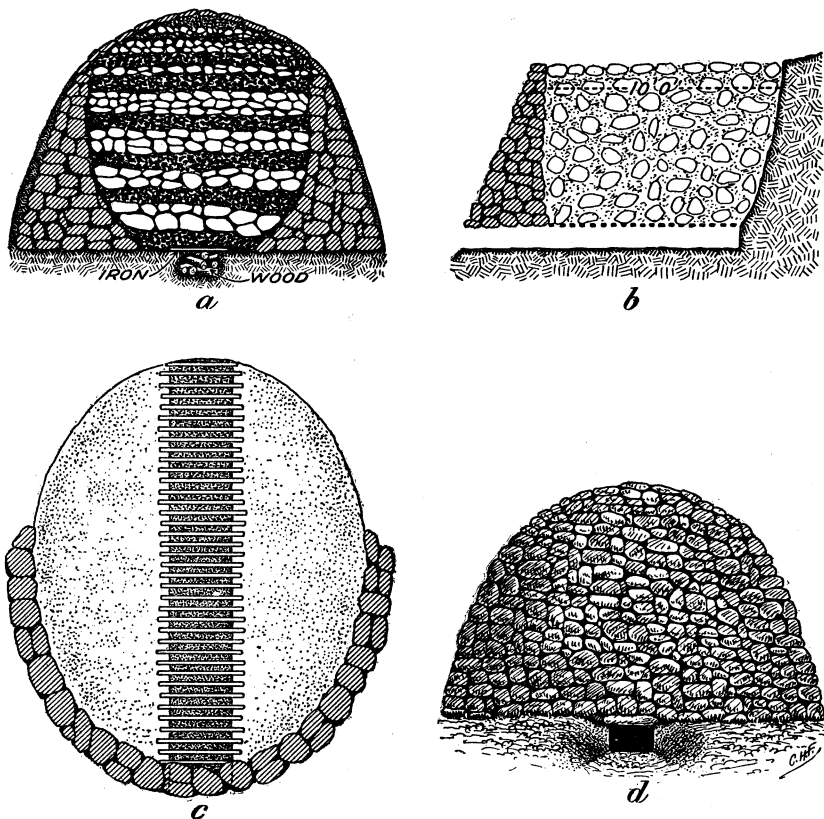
Details of construction of a farm limekiln: *a*, Cross section, showing layers of rock and coal; *b*, longitudinal section, showing side hill used as back wall; *c*, ground plan, showing trench and grate; *d*, completed kiln, walled in and plastered with mud.
